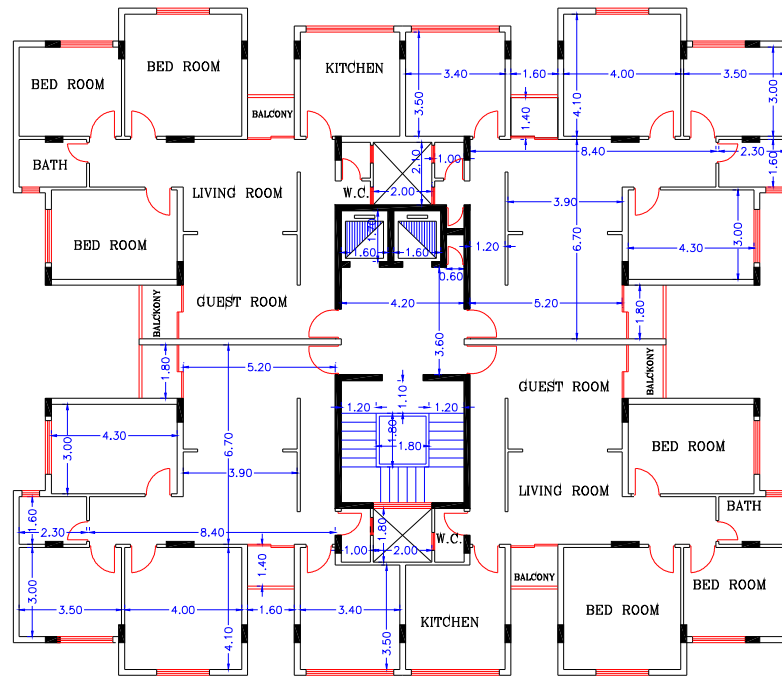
Typical floor plan for typical building at Ain-Jalout Housing Project
